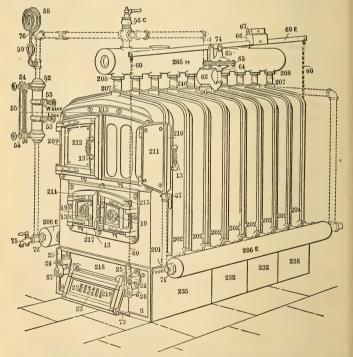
Parts of Sectional Steam and Hot Water Boilers.
